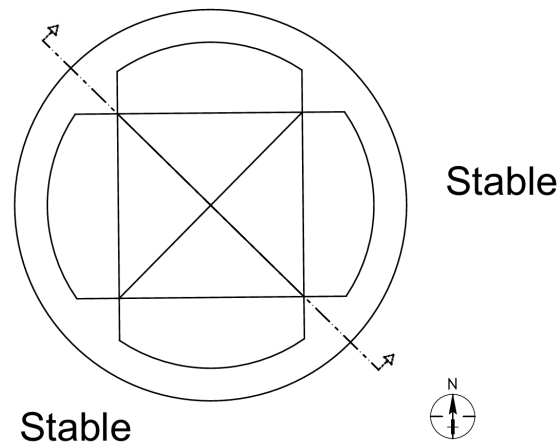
Schematic drawing of plan view indicating the position of the diagonal section of the vault in Skörstorp's Church.
